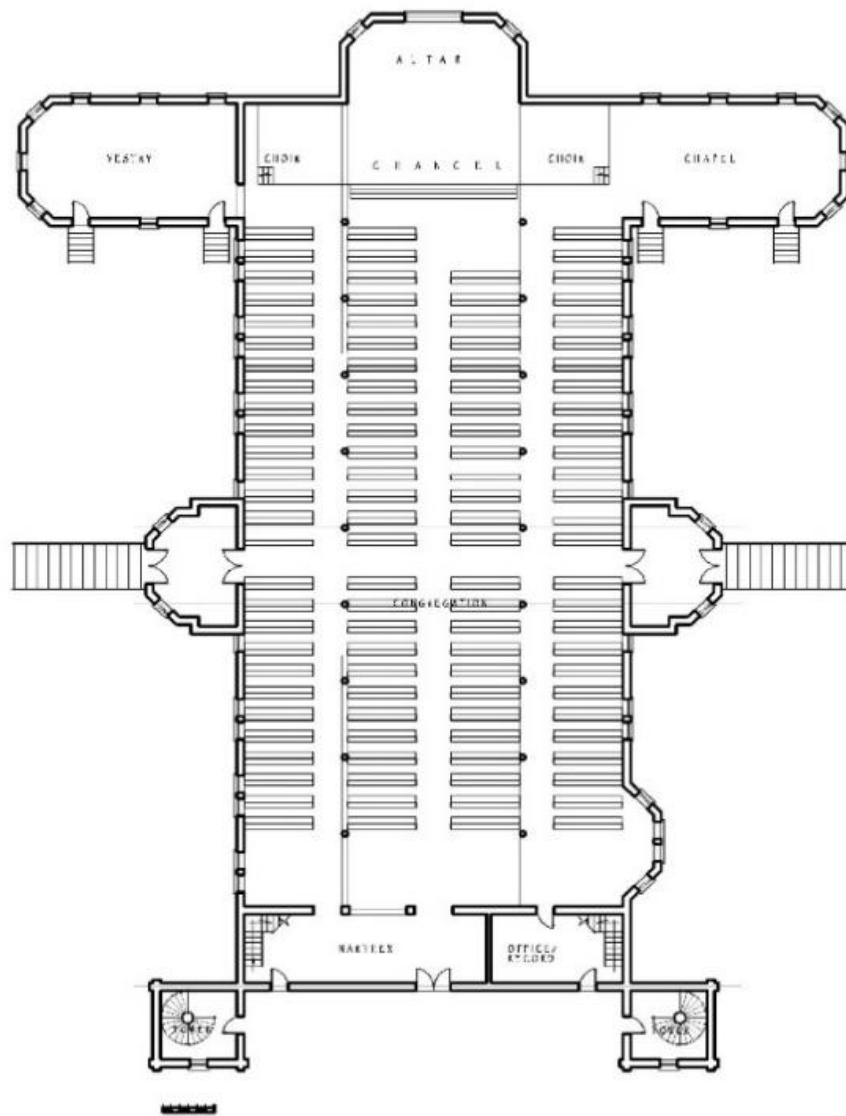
Ground floor plan of St. Peter's Cathedral Aremo.
